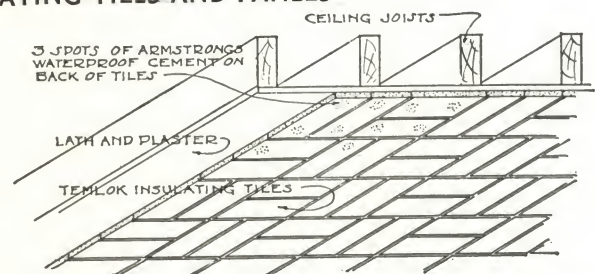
Application of Temlok Insulating Tiles on Plaster
